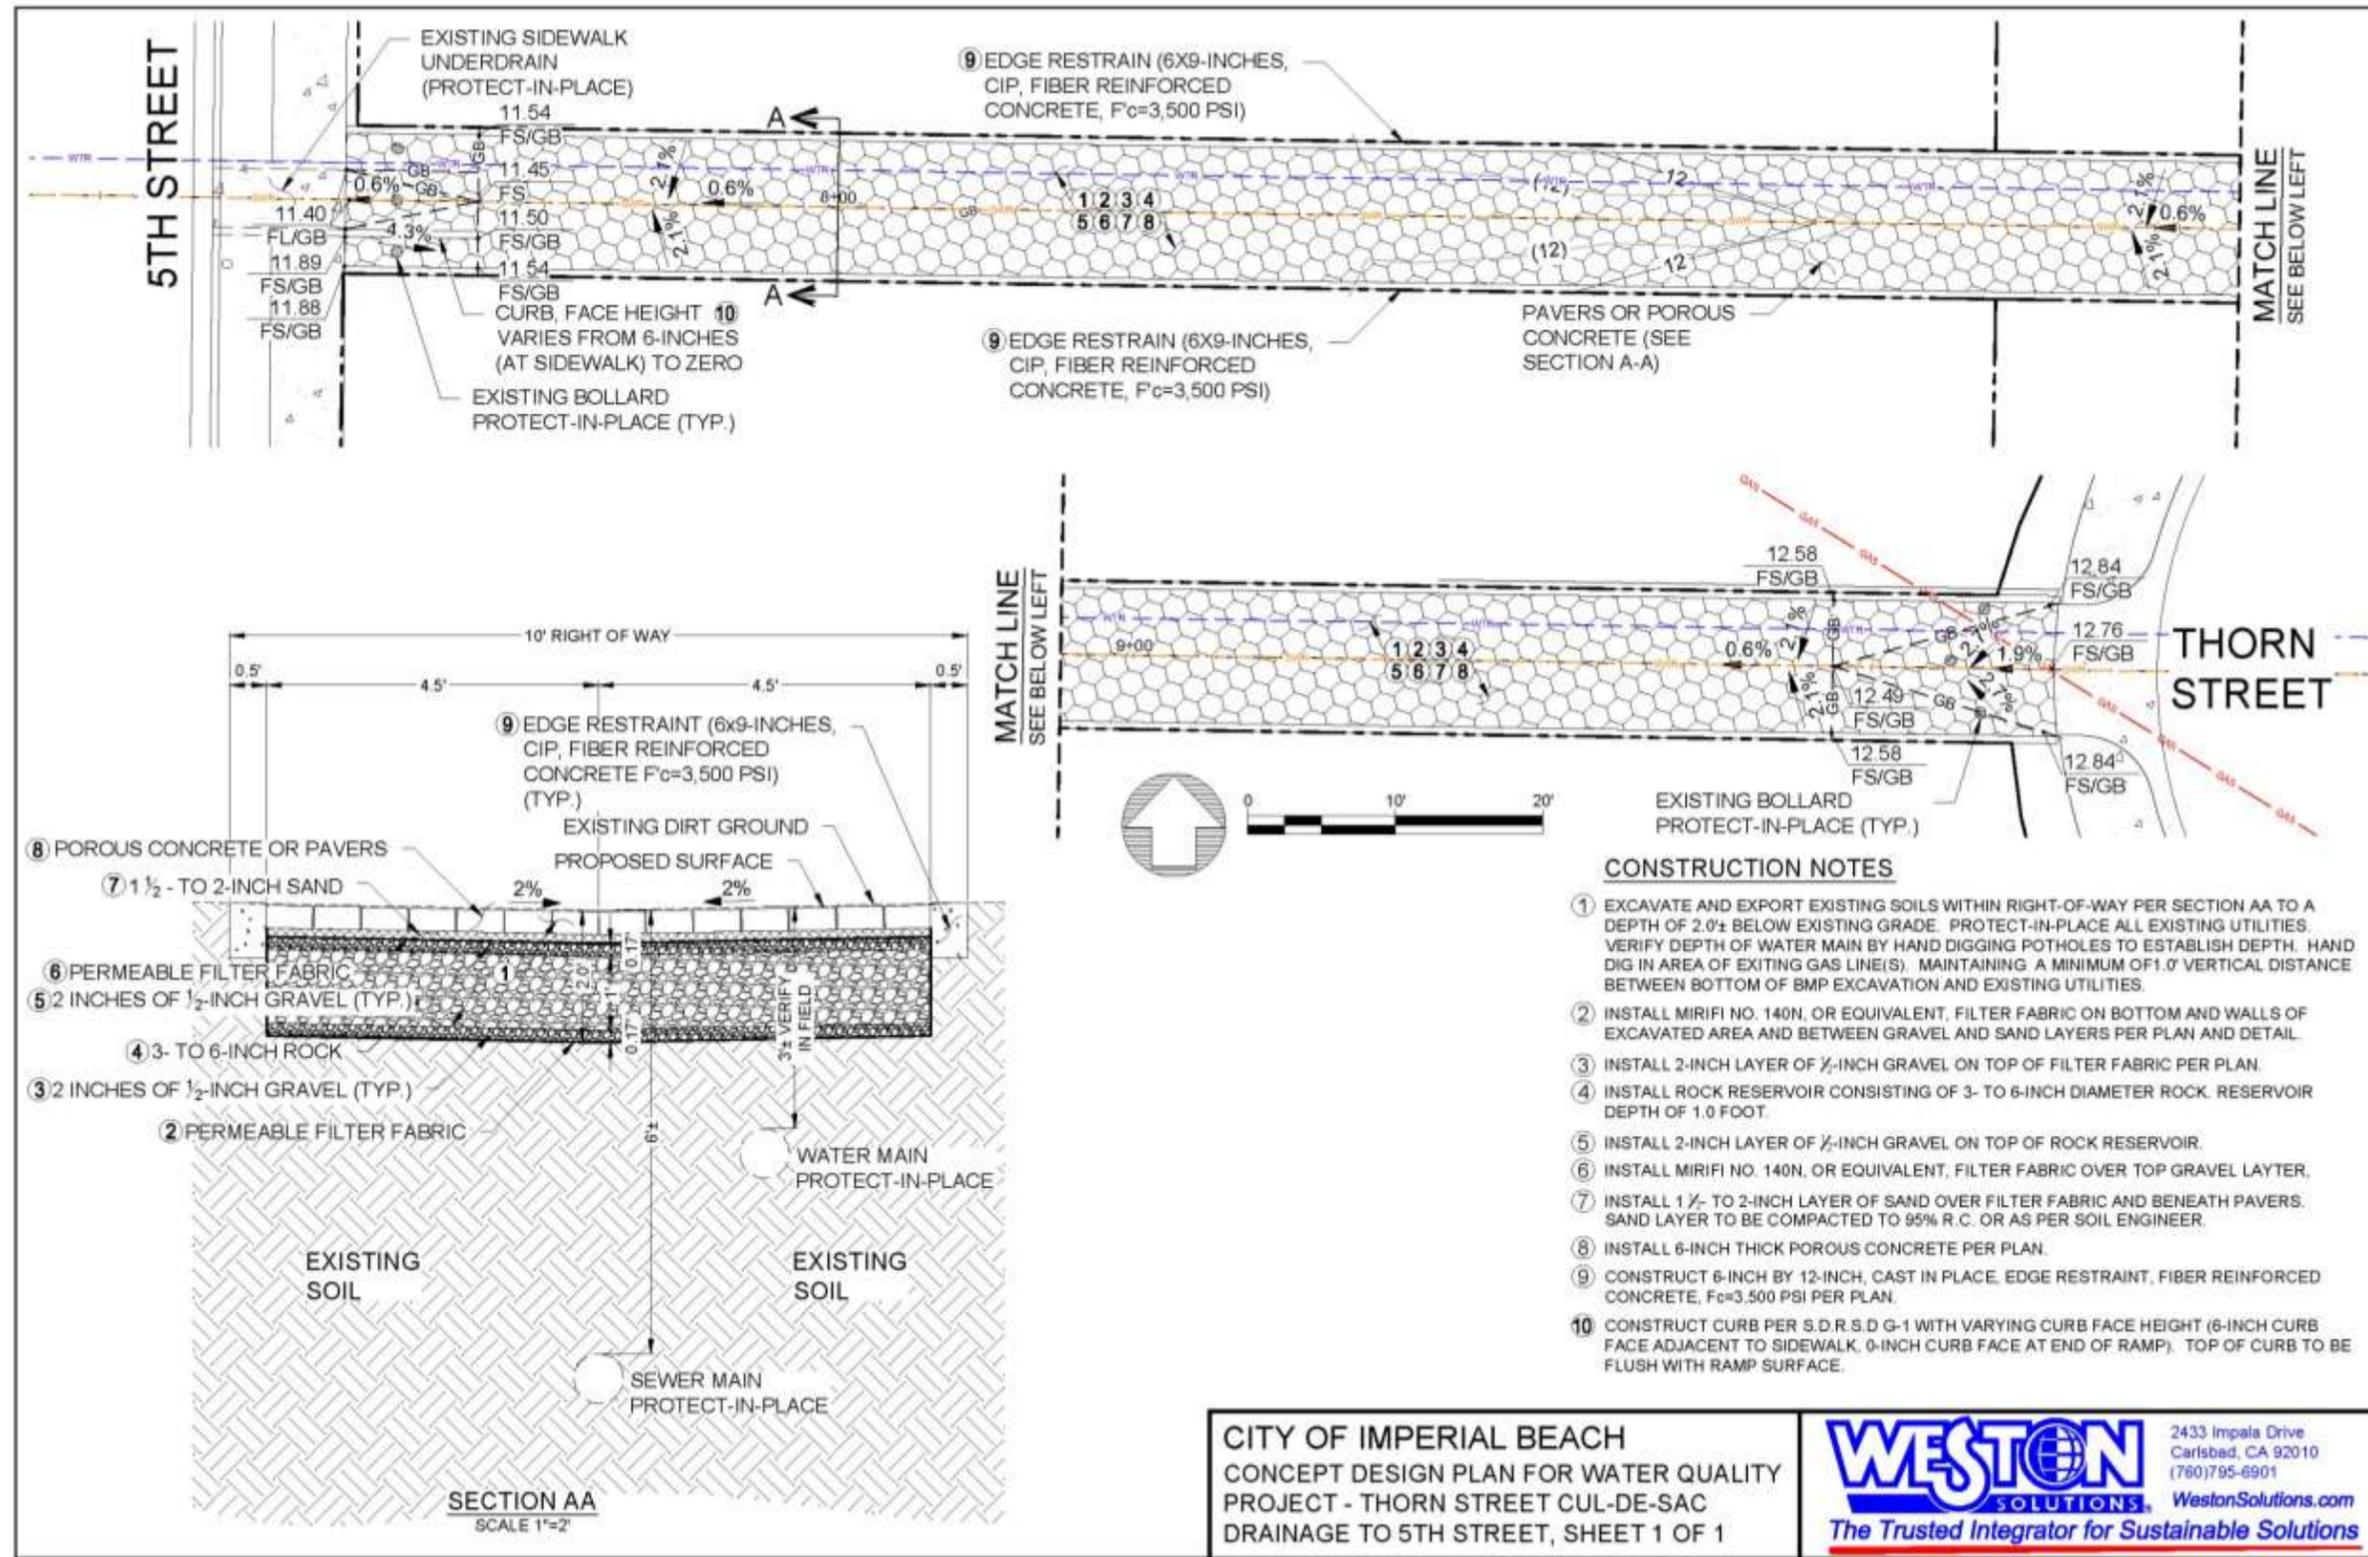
Thorn Street Cul-De-Sac Drainage Right-Of-Way Porous Concrete Concept Design Plan
